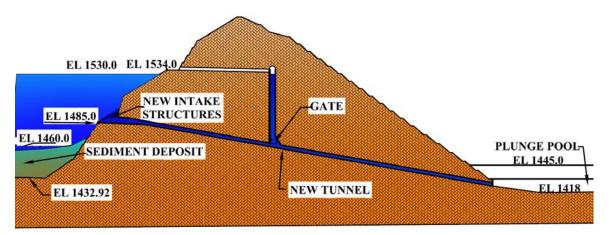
Longitudinal section of flushing tunnel constructing new tunnel
